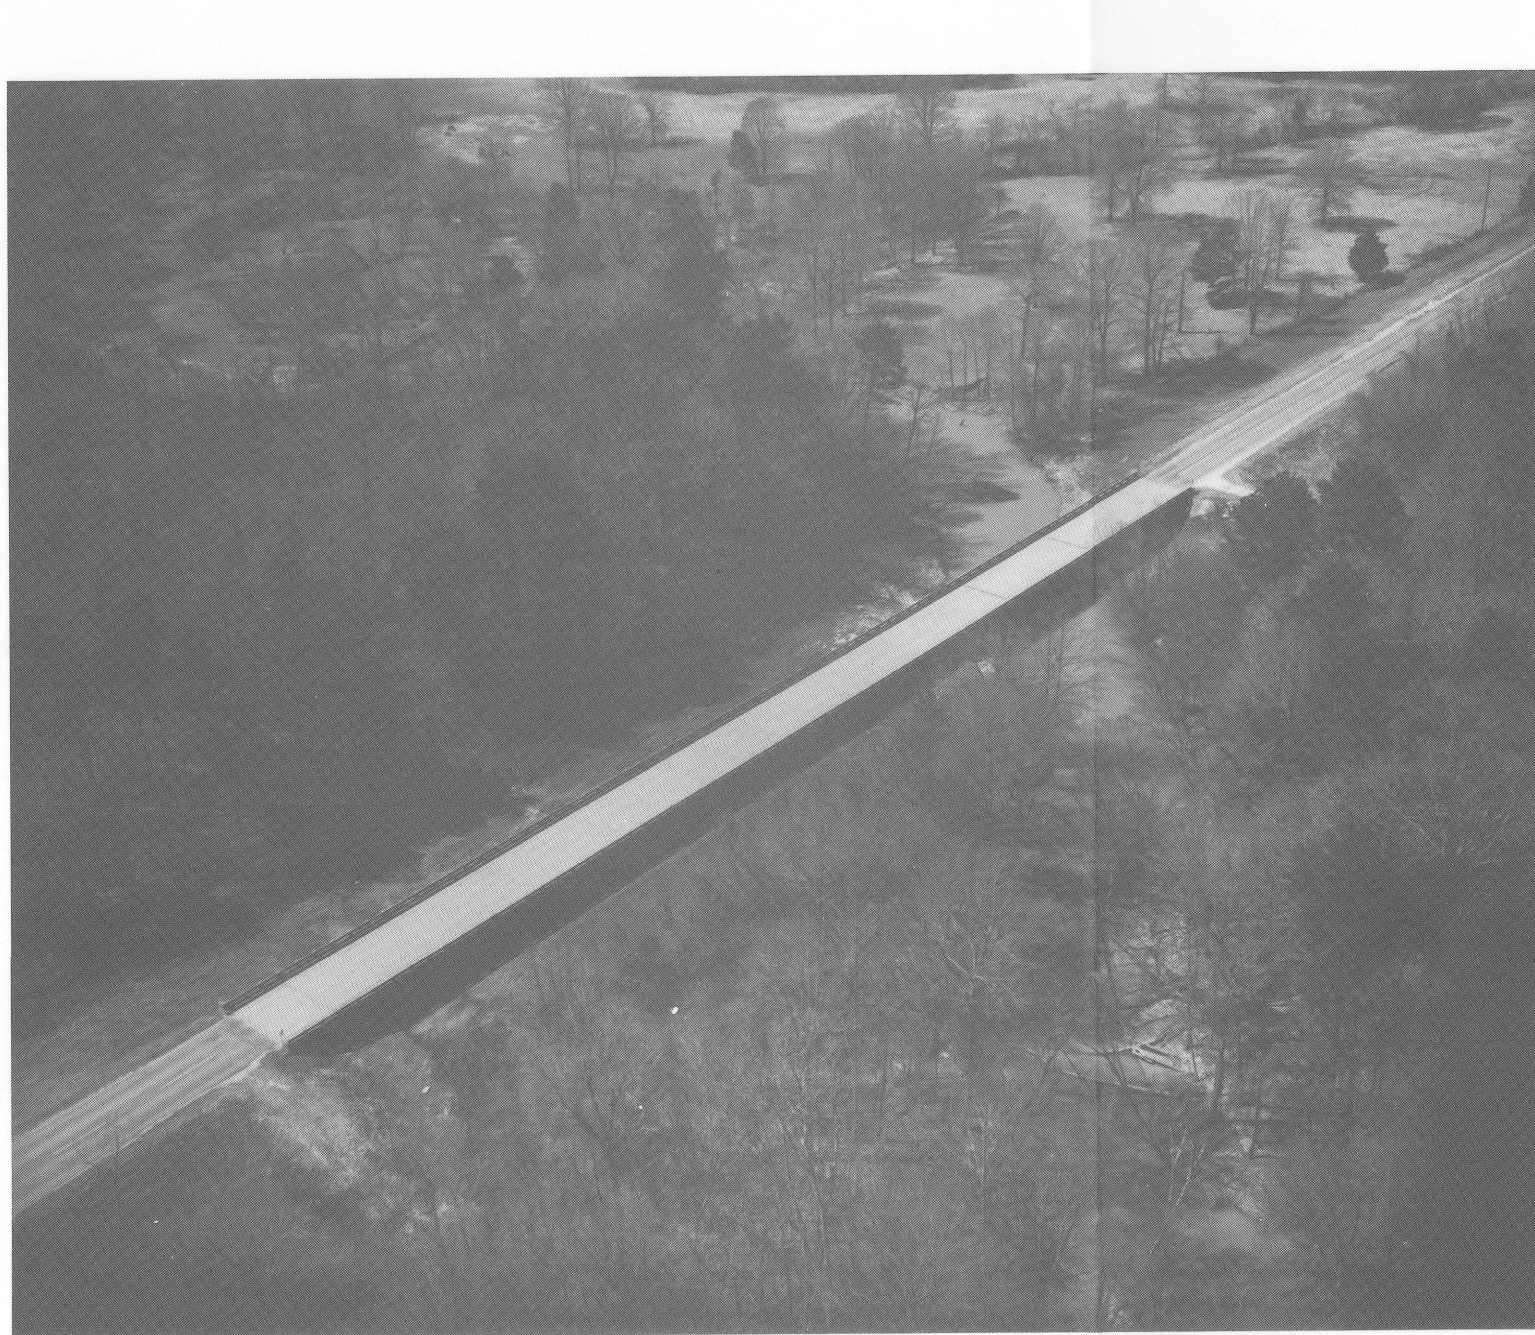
AERIAL VIEW LOOKING DOWNSTREAM AT BRIDGE ON STATE HIGHWAY 528 AT WALDRUP, MISSISSIPPI, MARCH 22, 1978.
